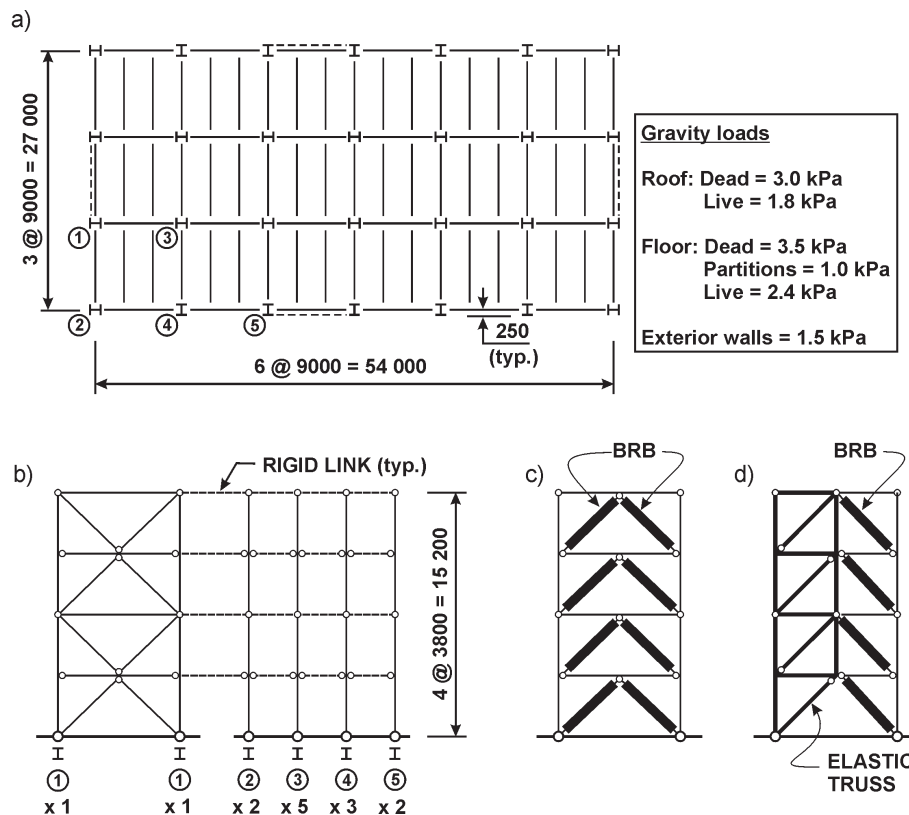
Buildings studied: (a) floor plan view; (b) analytical model of the MD and LD braced frames; (c) elevation of the BRB frame; (d) elevation of the dual BRB frame.
